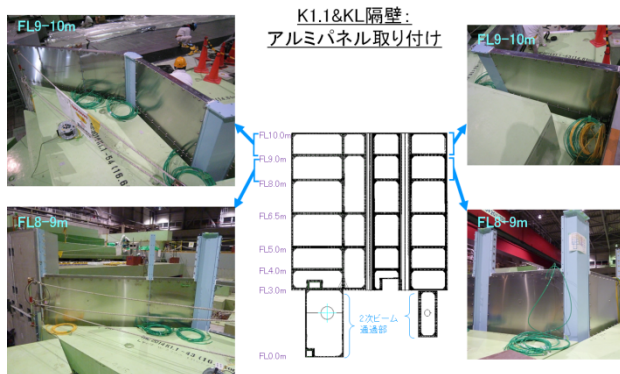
The airtight wall between FL8m and FL10m in K1.1-KL beamline.
